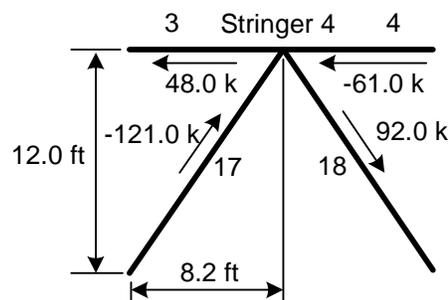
and 14 show similar forces for the floor truss at Panel Point U10 at Stringers 3 and 4, respectively, assuming the stringers are acting compositely with the floor truss. Forces are taken from Tables 25 and 26. The horizontal shear at Stringers 3 and 4 leads to composite action between the stringers and the floor truss that causes a reduction in the upper chord forces compared to those shown in Figure 12. Figure 6 shows that the
